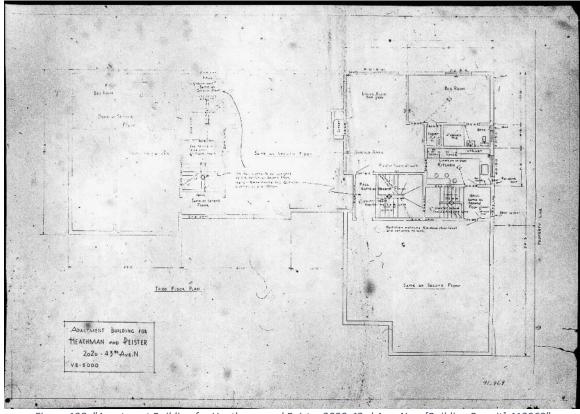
"Apartment Building for Heathman and Peister 2020-43rd Ave. N. ... [Building Permit] 412969"
